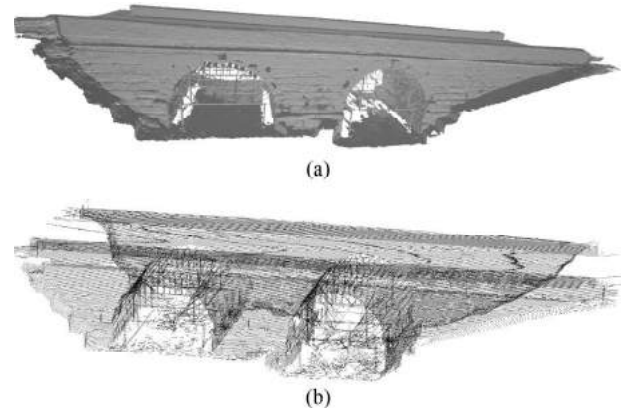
(a) 3D light model; (b) cross sections of the bridge.
